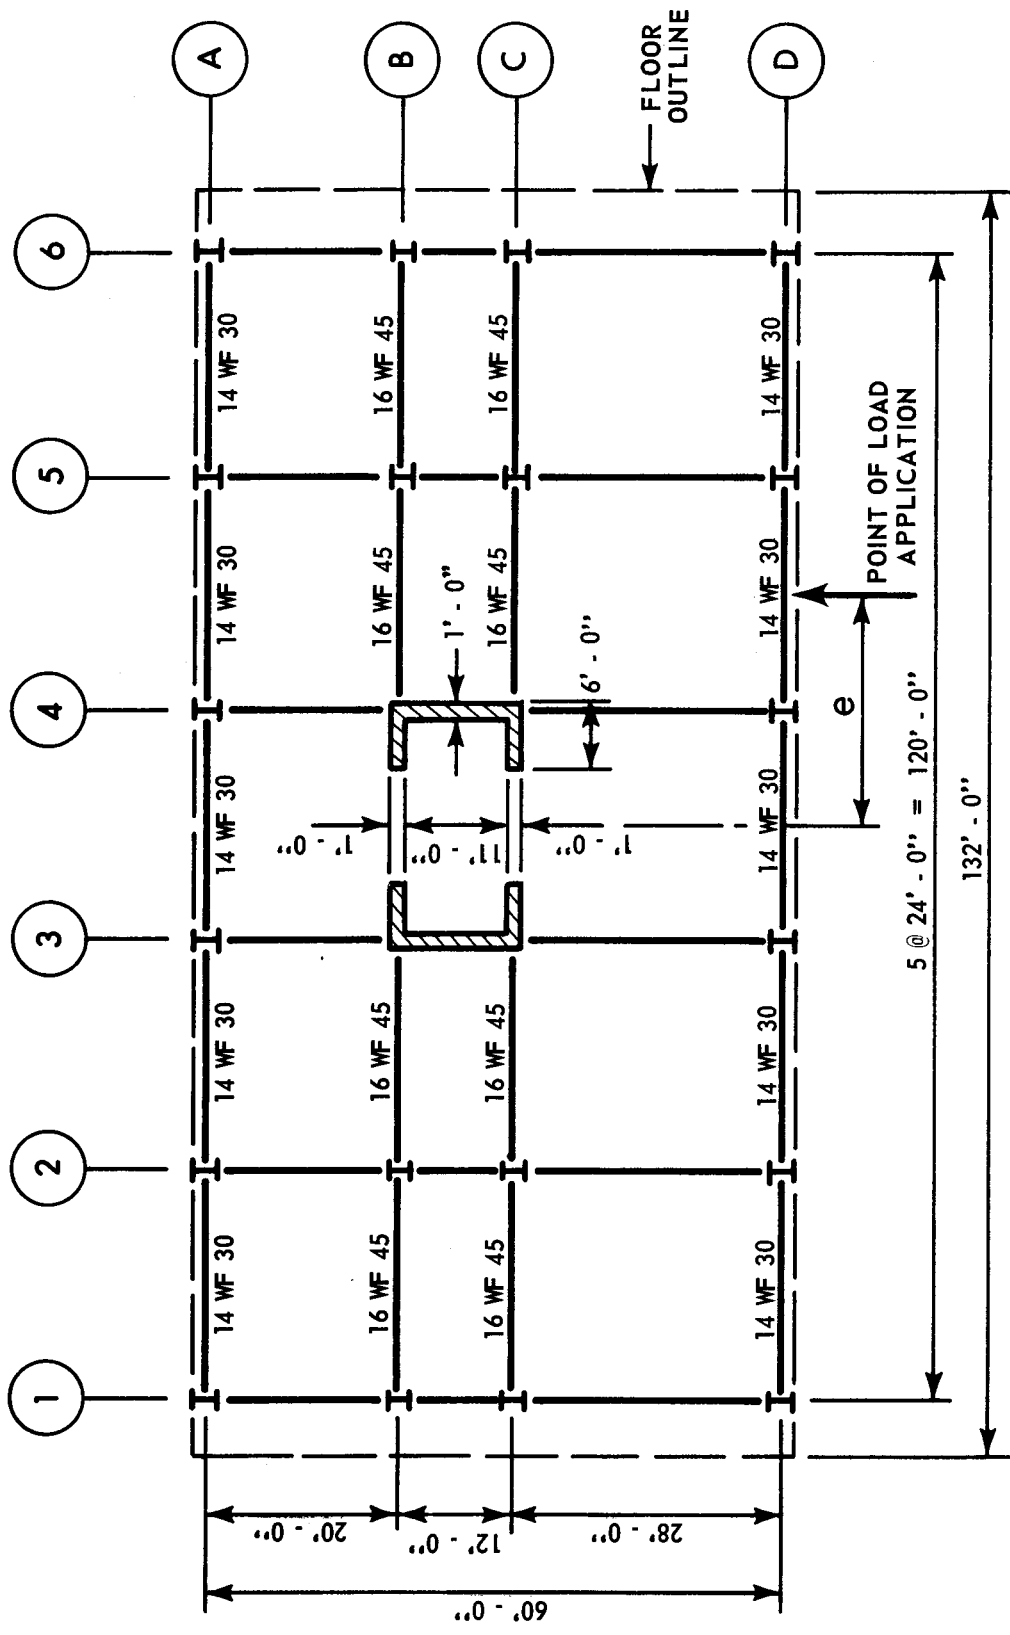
PLAN TWENTY-FOUR STORY STRUCTURE L
